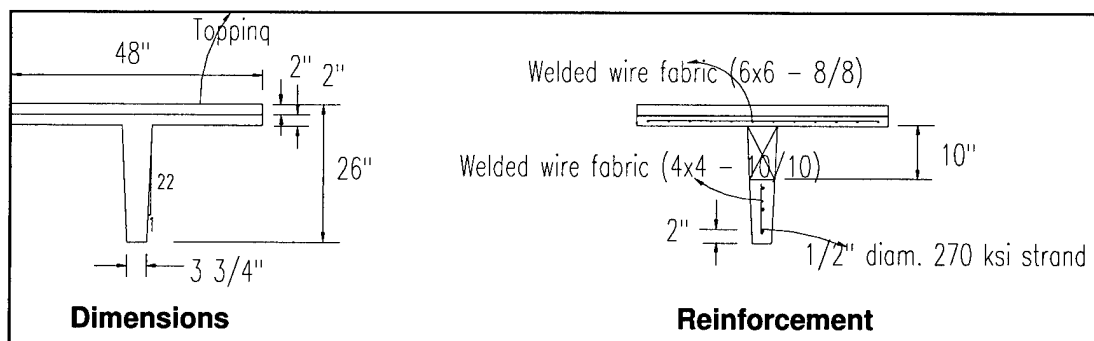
Long-span test beam sections from Barney et al. 1977).
